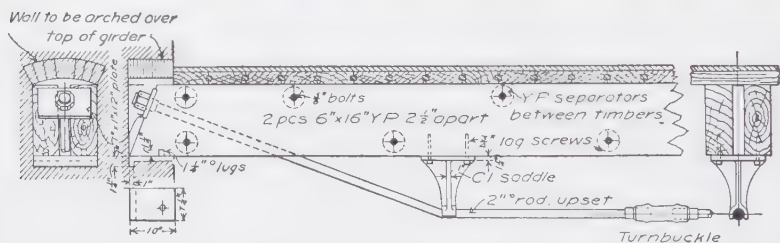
Details of Trussed Floor Beams for Warehouse.
